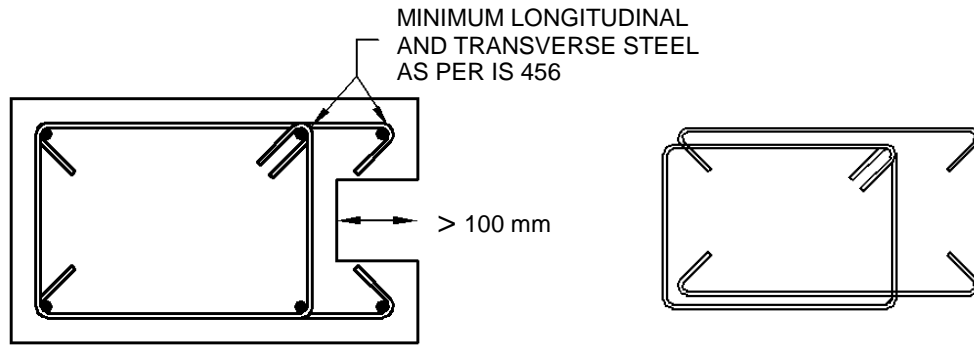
REINFORCEMENT REQUIREMENT IN COLUMNS WITH PROJECTION MORE THAN 100 MM BEYOND CORE
